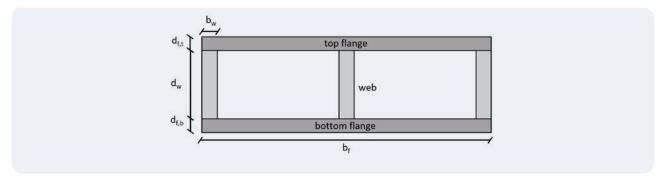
Notation for typical cross-section of ribbed deck floor system with top and bottom flange.
